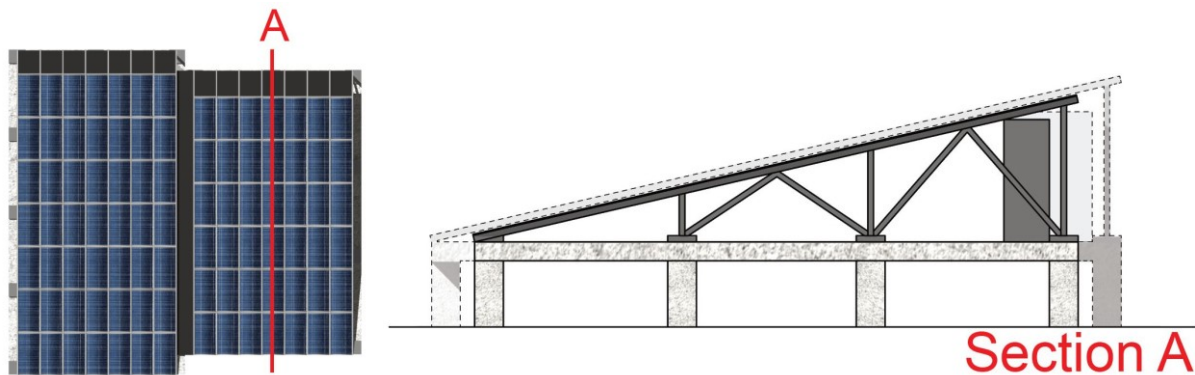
BIPV/T Plan view (left) and section through the system, framing and building structure (right)
